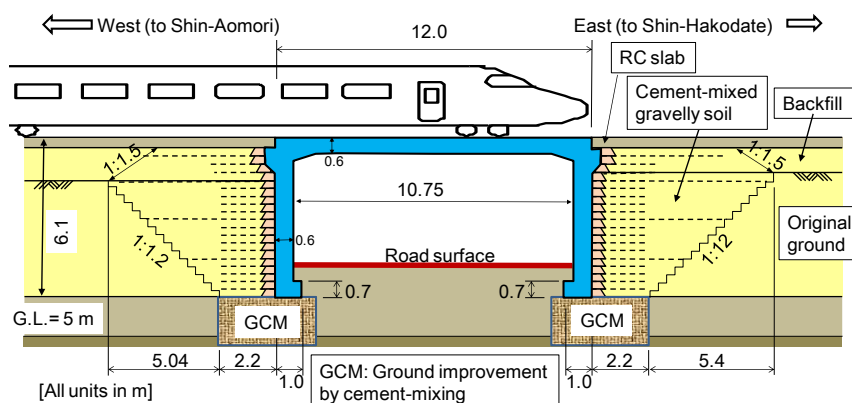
GRS integral bridge at Kikonai, Hokkaido Shinkansen (see Fig. 3-16d for location of the site).
